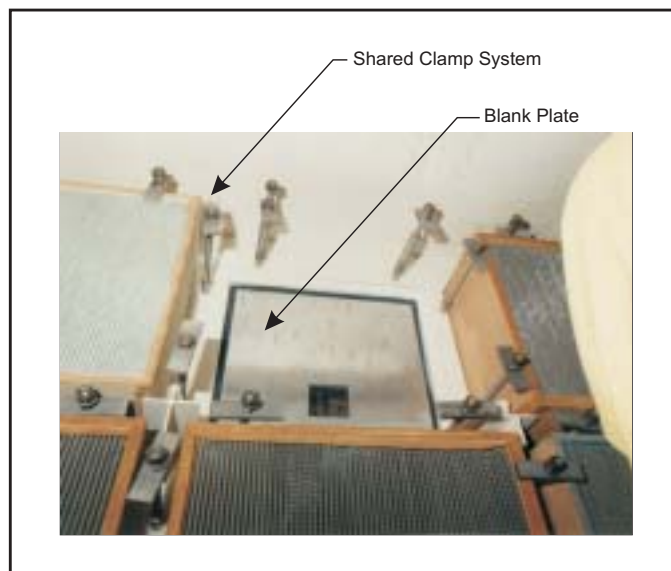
HEPA Filters Mounting Frame with Blanking Plate Installed for Filter Change
